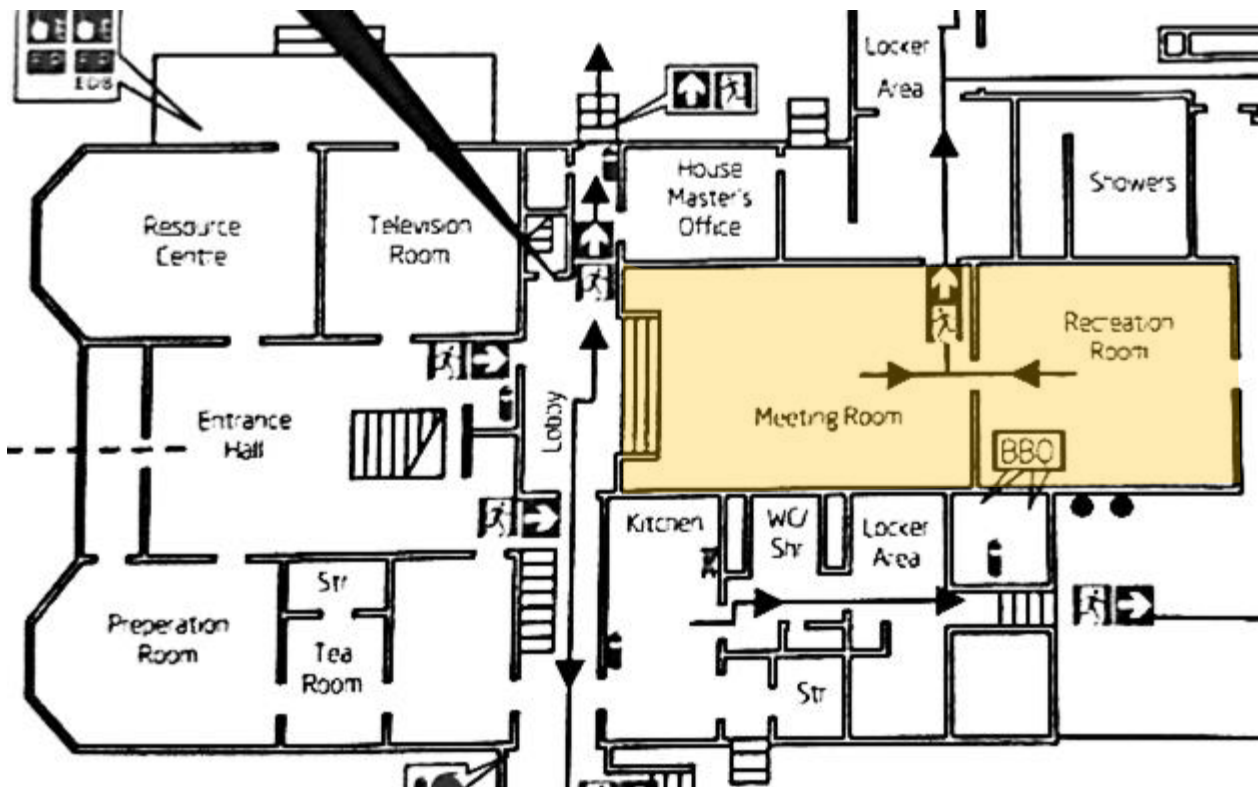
Floor plan of Gowan Brae House with 1904 additions highlighted
